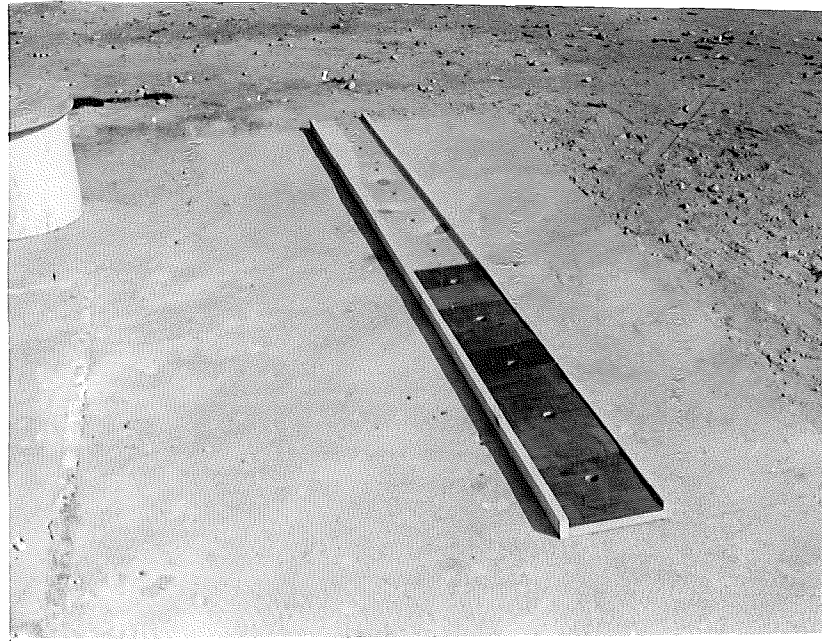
Wooden form used in constructing precompressed expansion and contraction joints. Form made to conform to crown of pavement. Length of form equals width of one lane.
